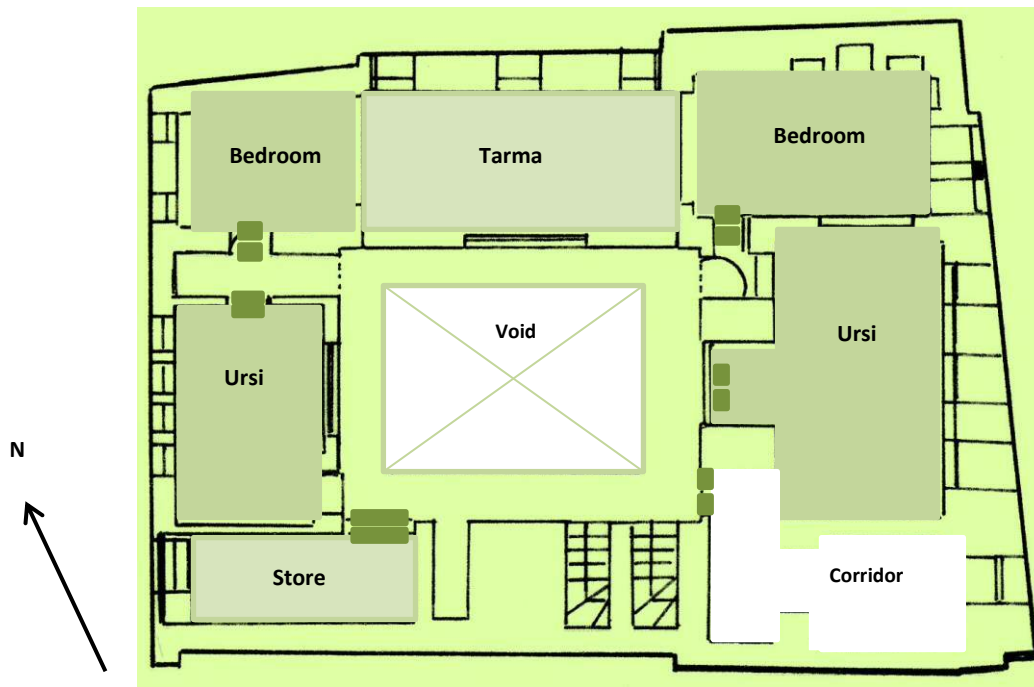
First floor level plan of traditional courtyard house No. 6. Scale: 1:50
